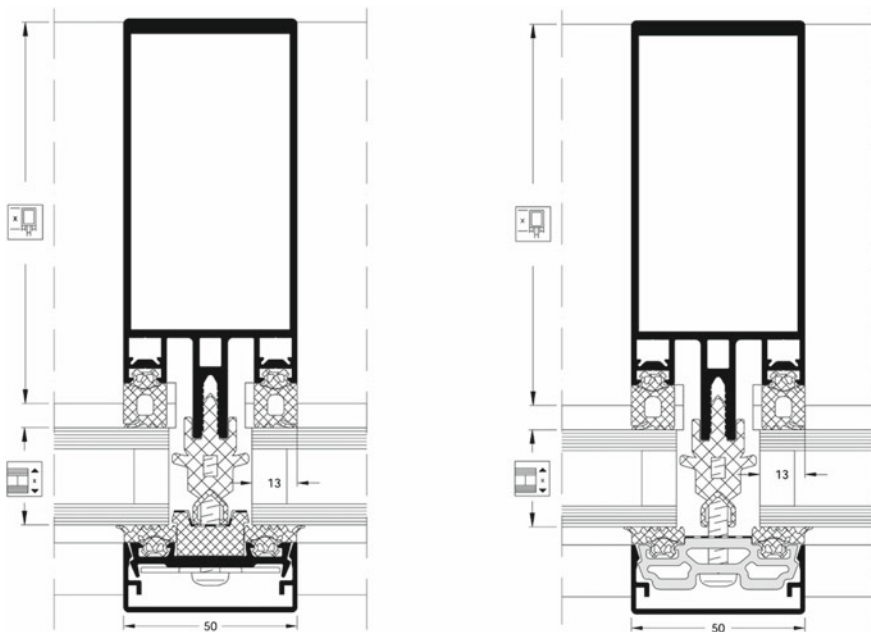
Giuseppe Colucci, School Building, Fauglia (Pisa). Framing of the façade system within the vertical structures, with the interposition of the windows and doors related to the profiles of the homogeneous curtain wall. © Courtesy of Schüco
